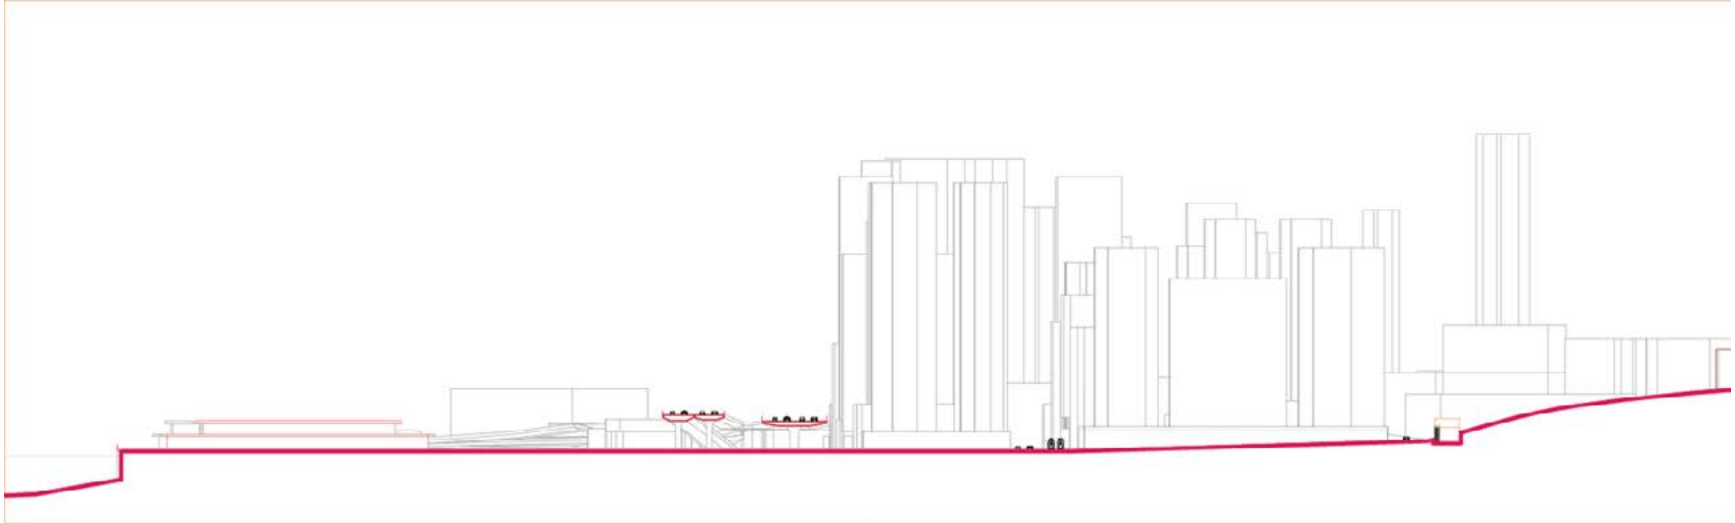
Section of the Whitty Street from the subway station to the waterfront.
